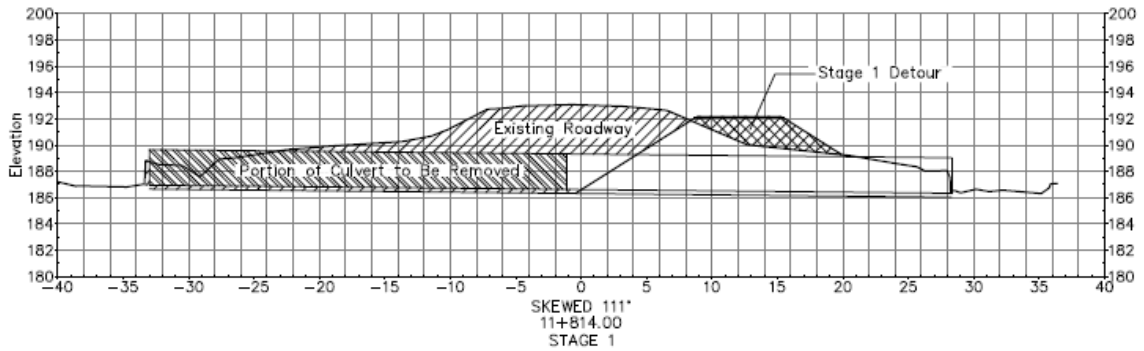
Staged construction for the replacement of culvert at Station 11+814, Stage 1
